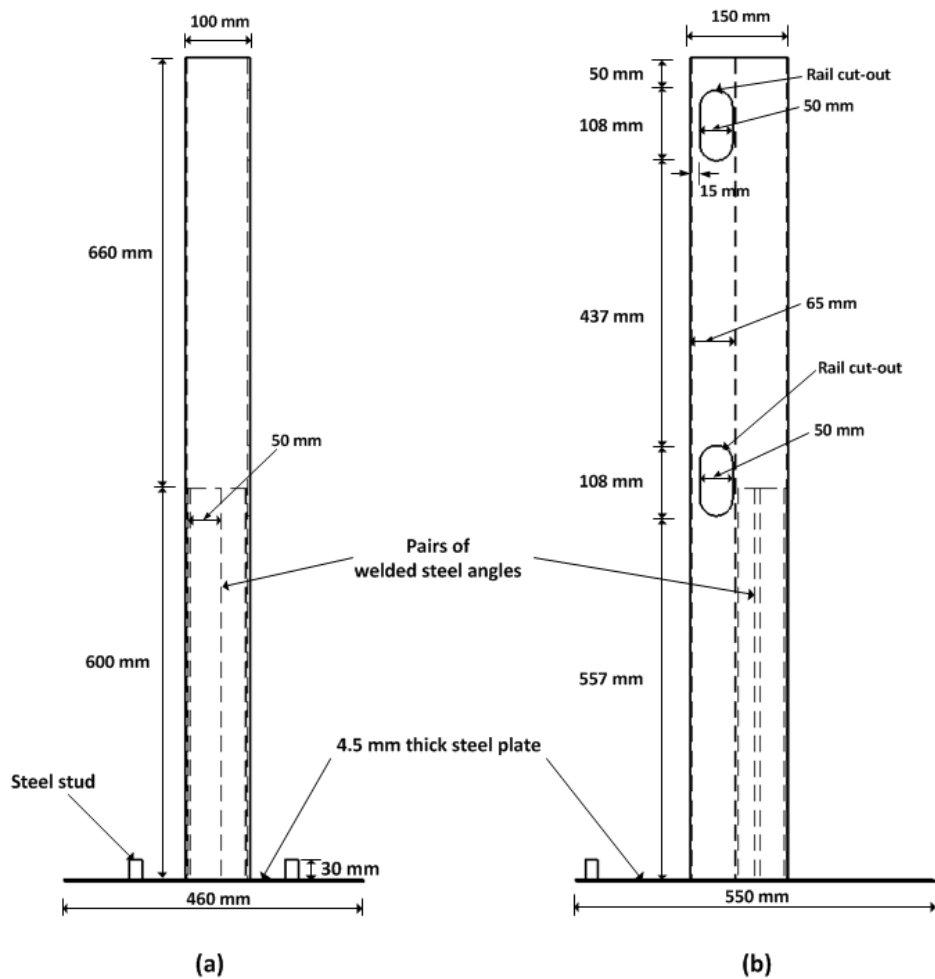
Details of the PVC post assembly: (a) Front-view and (b) Side-view
